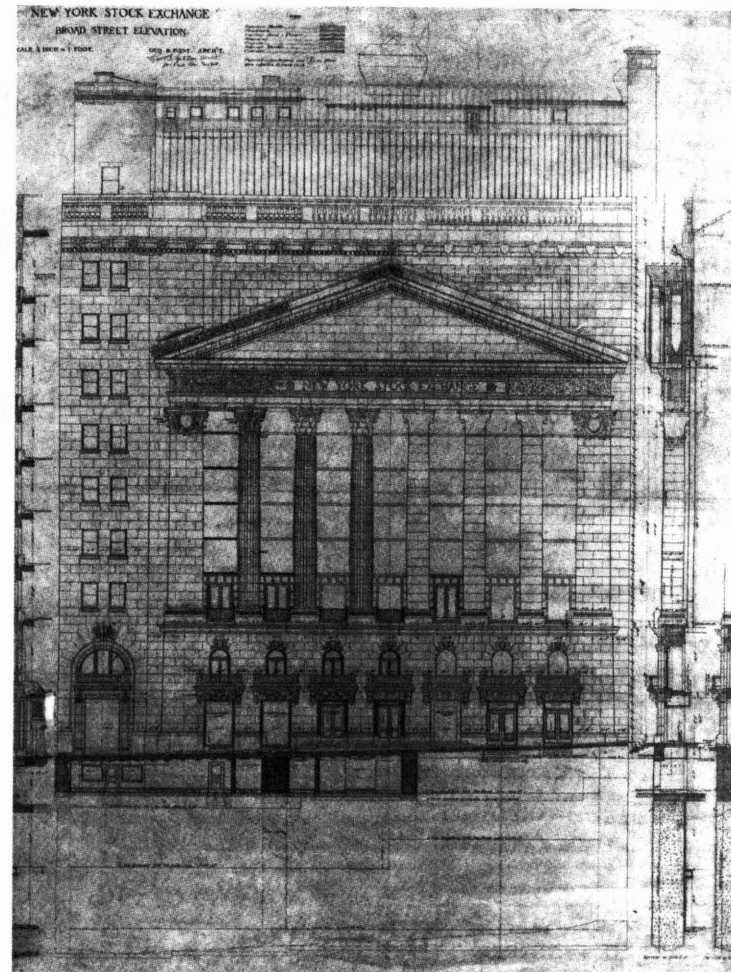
George Post's design for the New York Stock Exchange on Wall street
